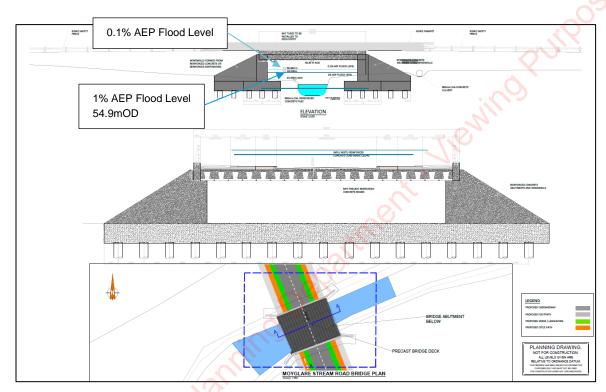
Proposed Bridge Layout- Road Bridge 2
